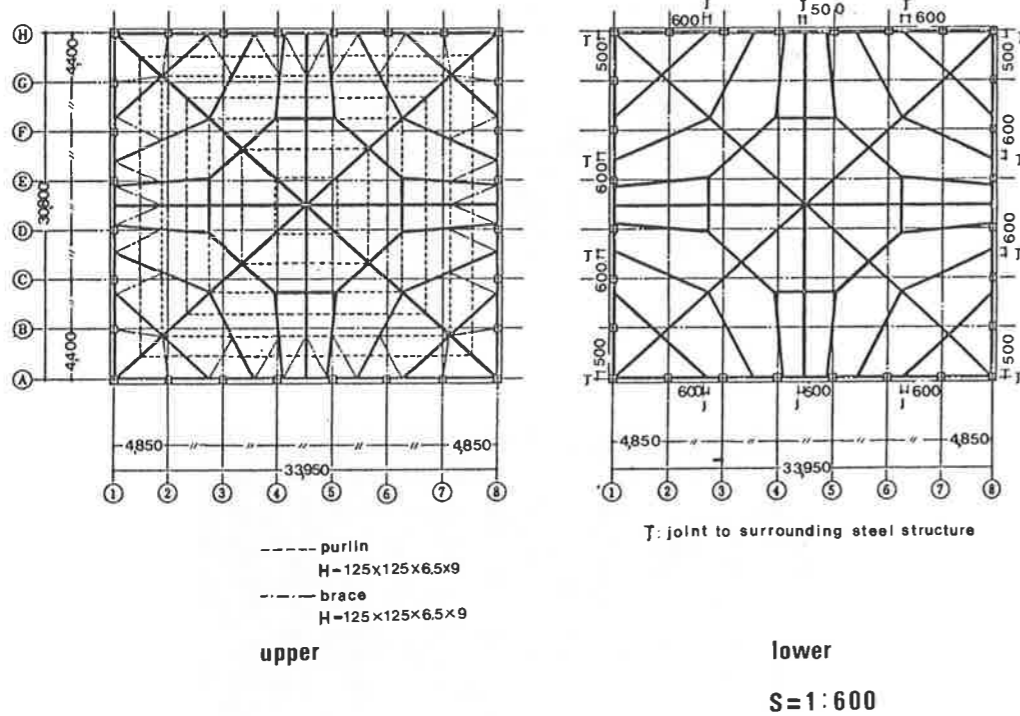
Beam plan of Gakushuin High-school gymnasium.
